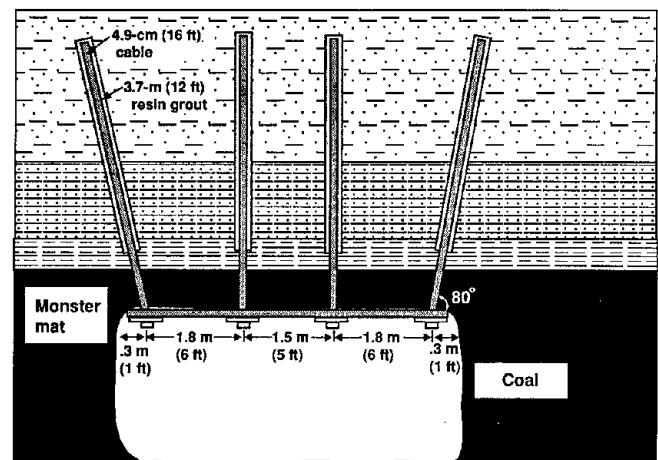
Generalized cross section of the cable spacing and lengths used in the gate road test areas.
